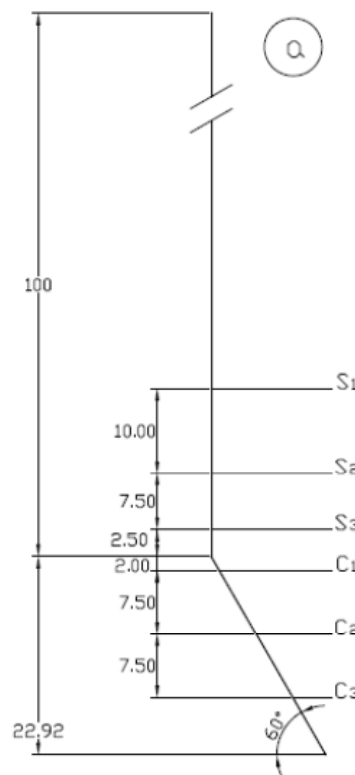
Positions for wall pressure measurement in a 30-degree hopper (Rao and Venkateswarlu 1974)
